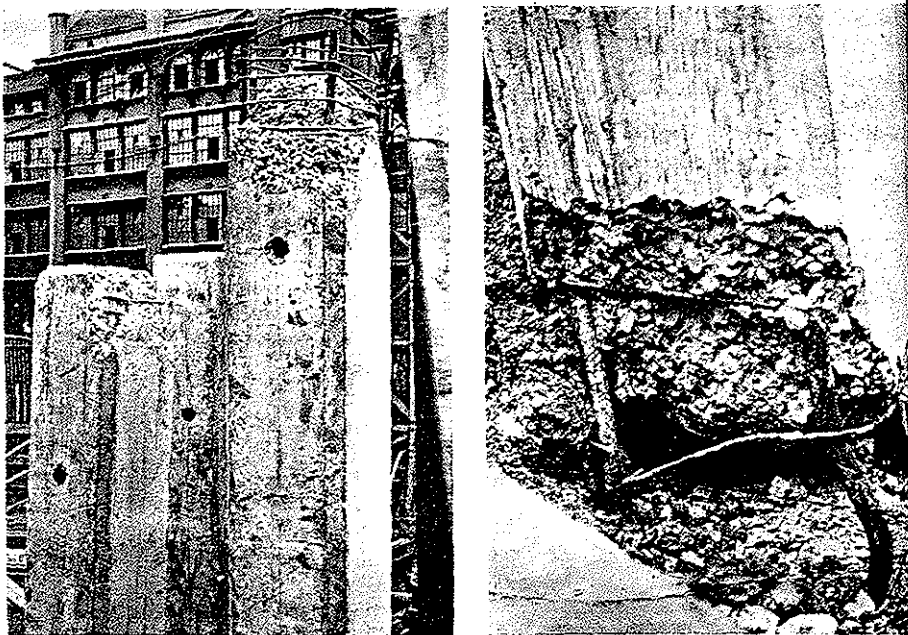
Examples of Failure in Reinforced Concrete Piles.
